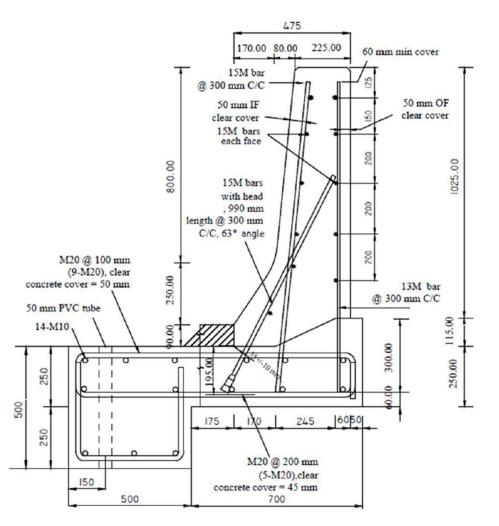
Barrier specimen B-3 details (Interior Location - With Cantilever)
